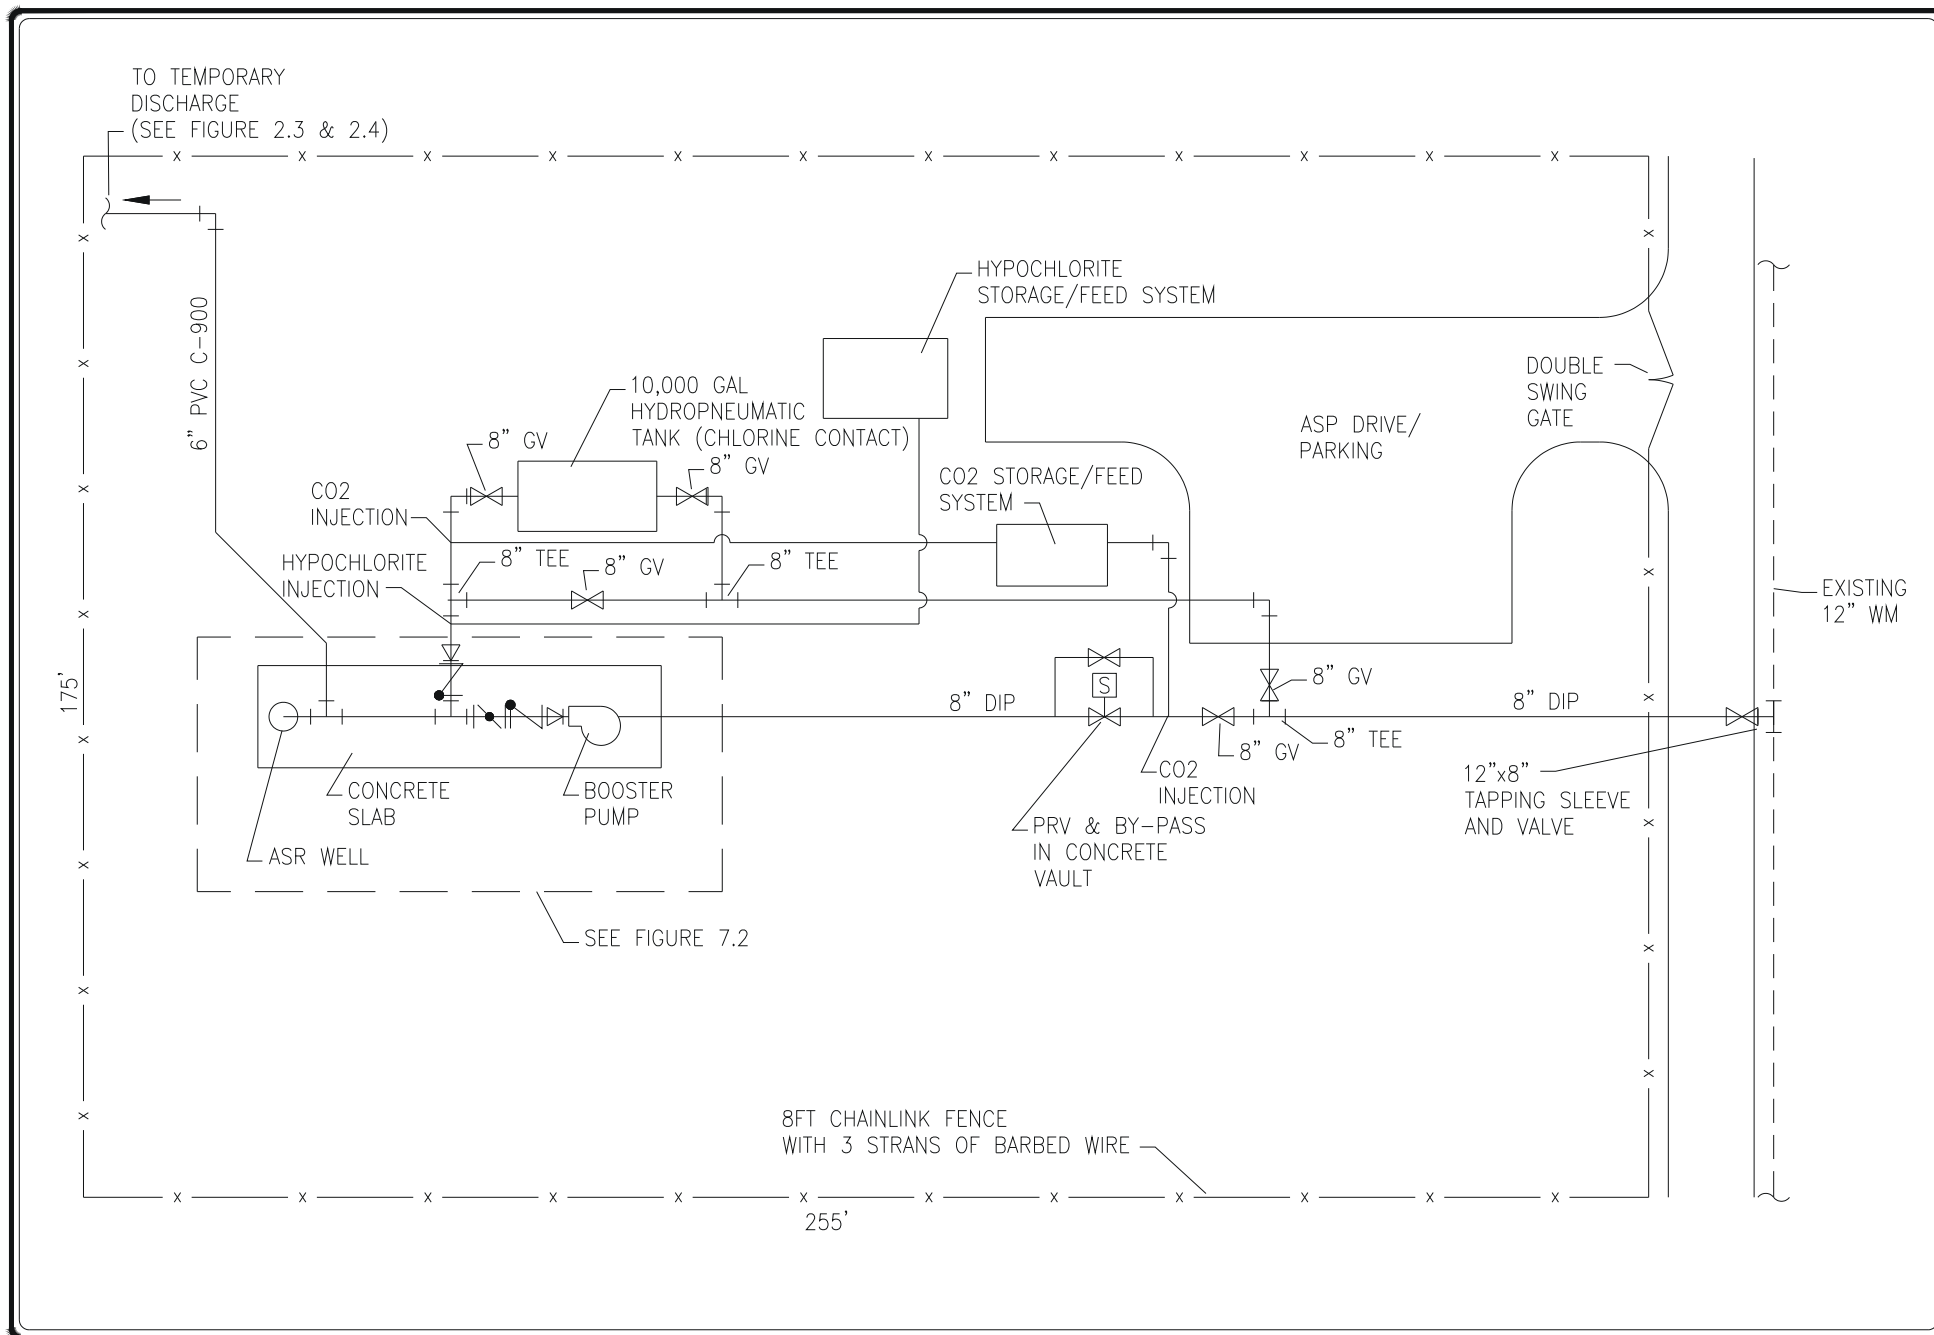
SITE PLAN WITH YARD PIPING SCHEMATIC FOR ALL ALTERNATIVE SITES.
